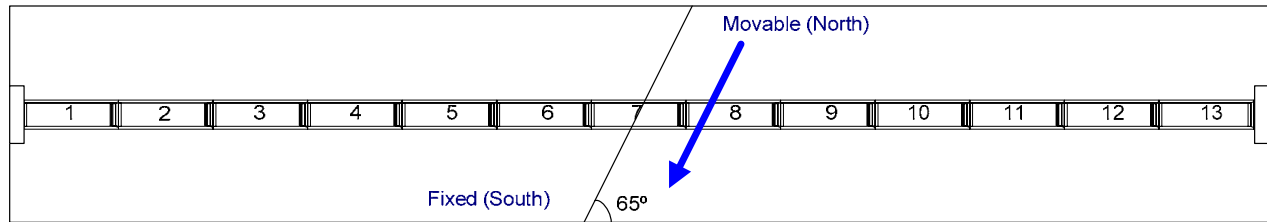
Layout of the segmented concrete pipeline in the Lifeline Experimental and Testing Facility's test basin.
